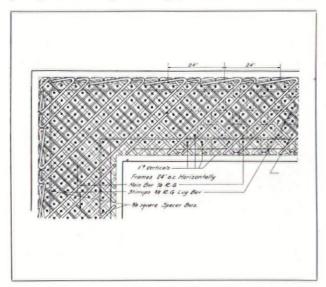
Plan of Horizontal System of Bent Bar Frames with Verticals
